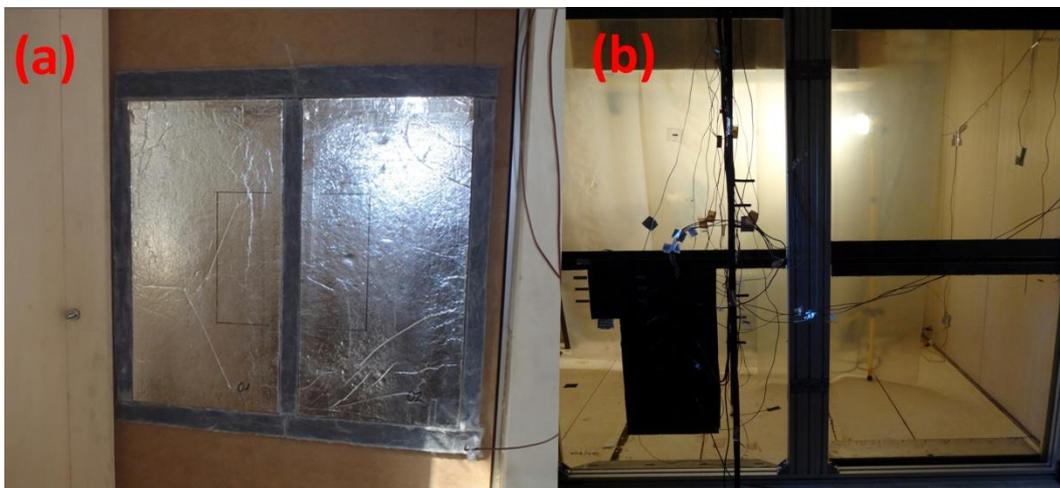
Thermal bridging measurement of : (a)Vacuum insulated panels for ETICS, (b) Glazing façade frames.
